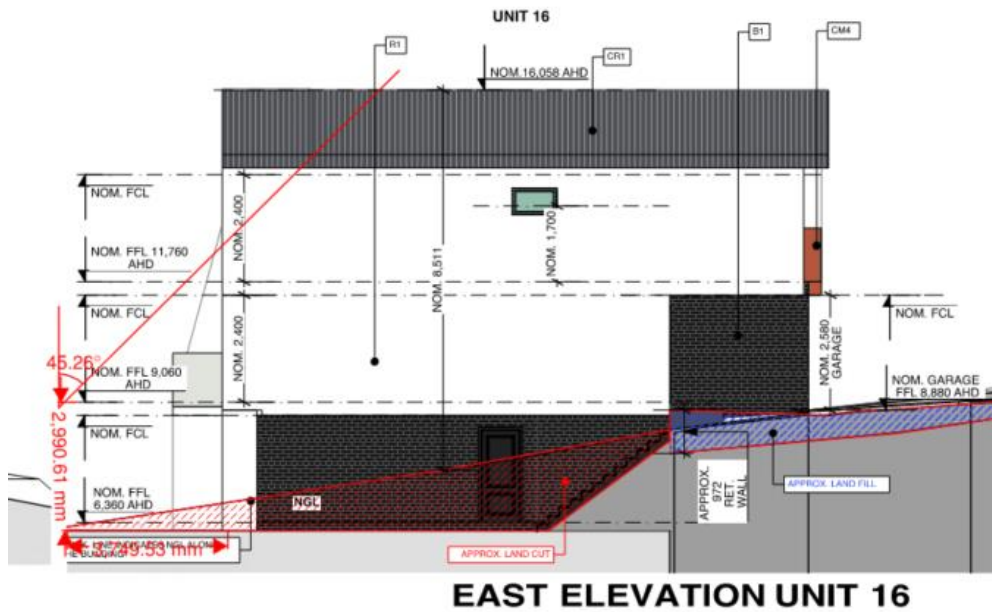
Approximate building envelope for unit 16, east elevation calculated by council officers.
